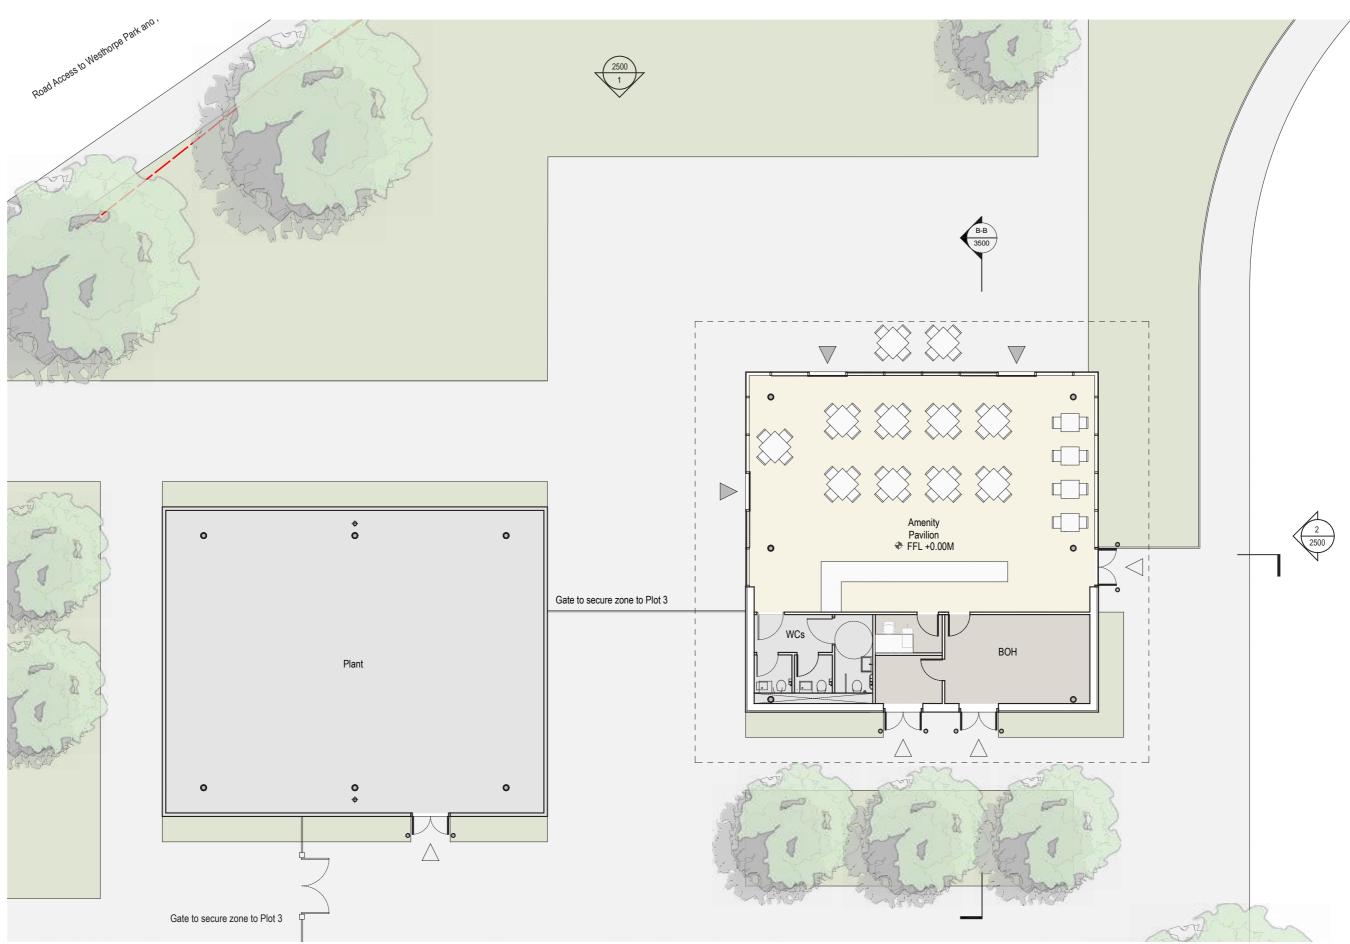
Plan of Amenity and Ancillary Pavilion
